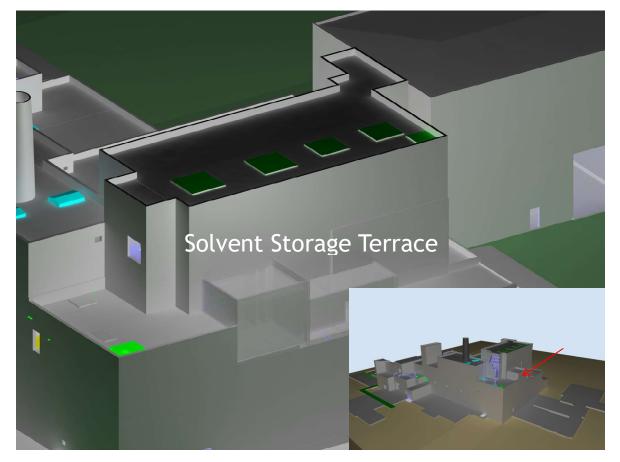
Main Plant Process Building Prior to Demolition (Facing Southwest)
